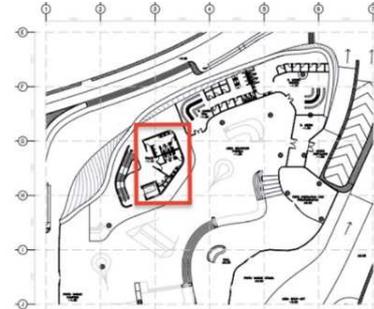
BO Project adapts the shape of the toilet rooms to the curved shape of the building. Source: Department of Architecture, Hasanuddin University [38].
